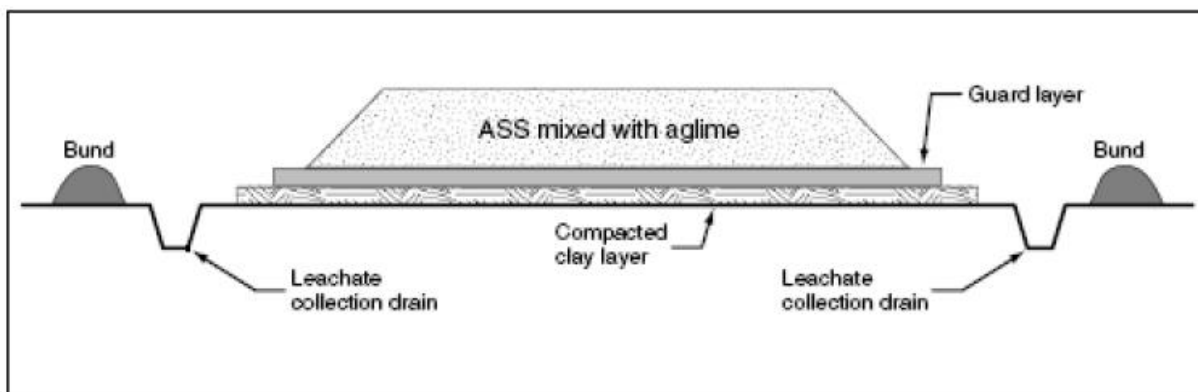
Schematic cross-section of a treatment pad, including clay layer (or hardstand concrete layer), guard layer, leachate collection system and containment with bunding.
